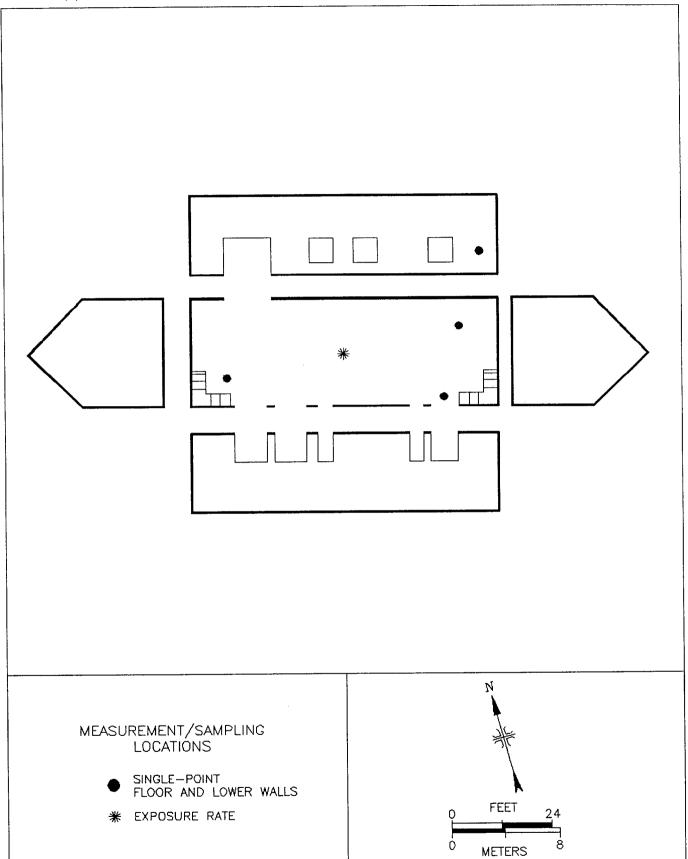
South Building, Area 5 — Measurement and Sampling Locations
